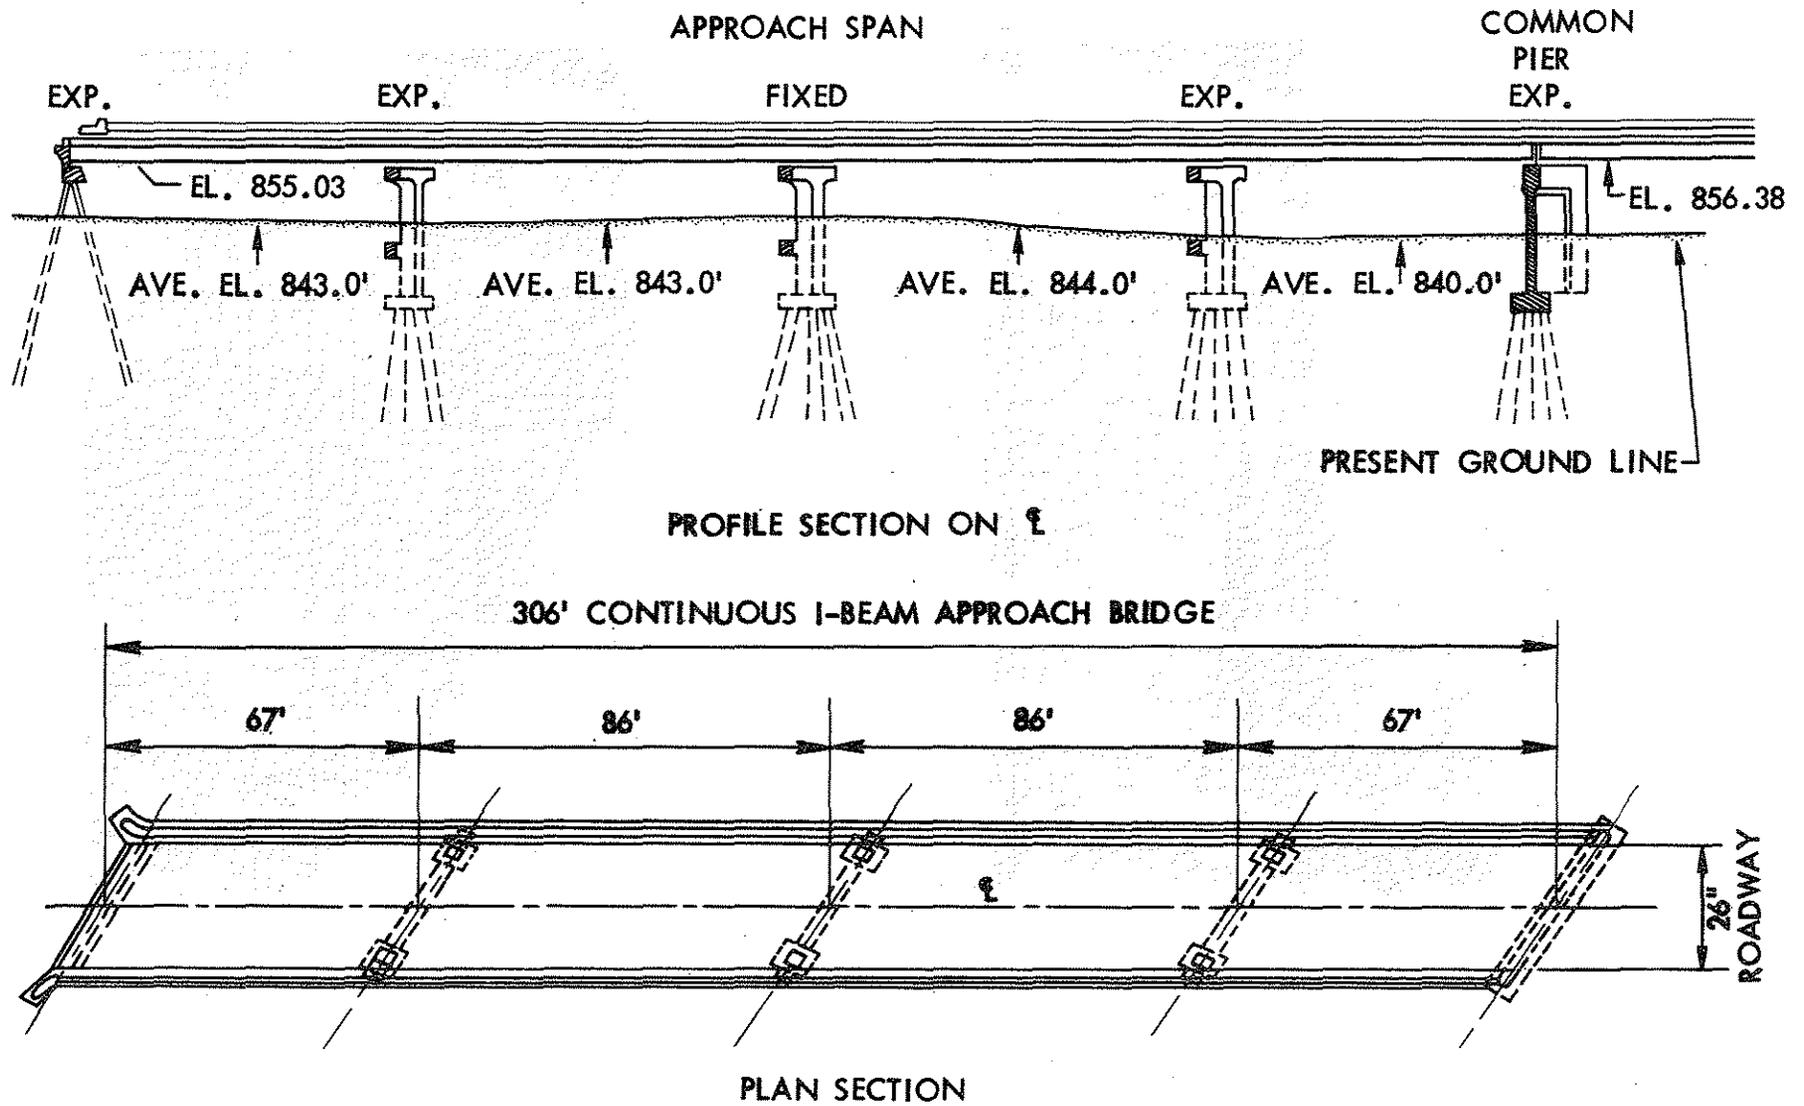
Profile and plan of approach bridge (Iowa 89).
